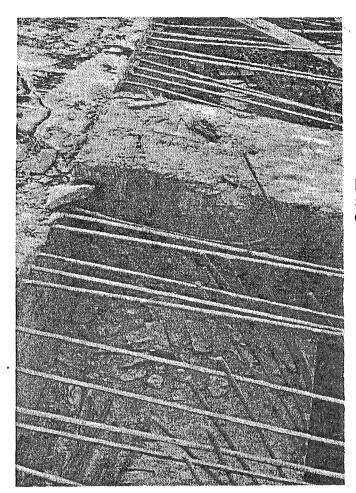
Crushing of spreader beam at top slab expansion joint.
